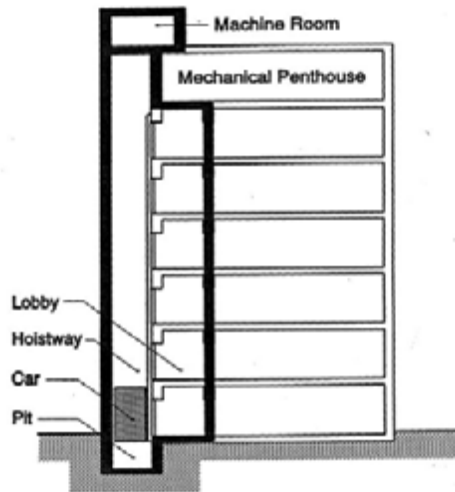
Elevator system including elevator equipment, machine room, hoistway and elevator lobby (Courtesy of Dr. John H. Klote, PE)
